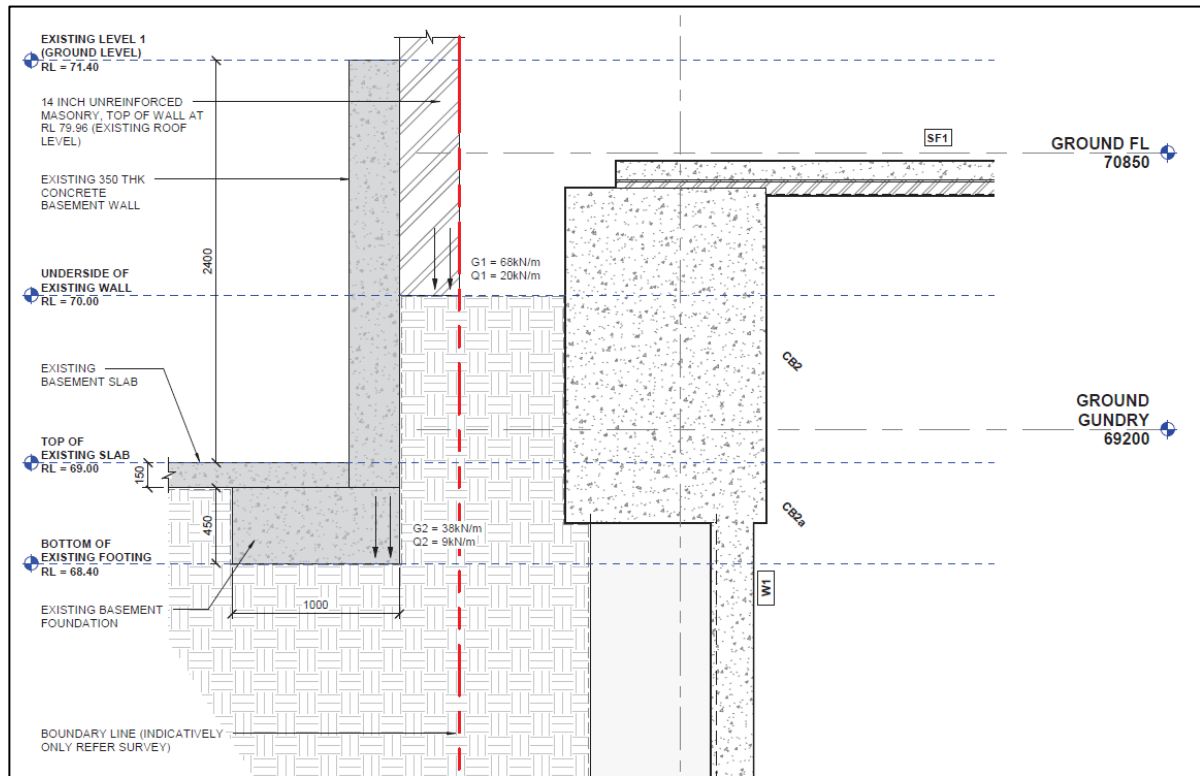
582 Karangahape Road Western Boundary Cross Section (Source: Sheet S312, Enovate Consultants)
